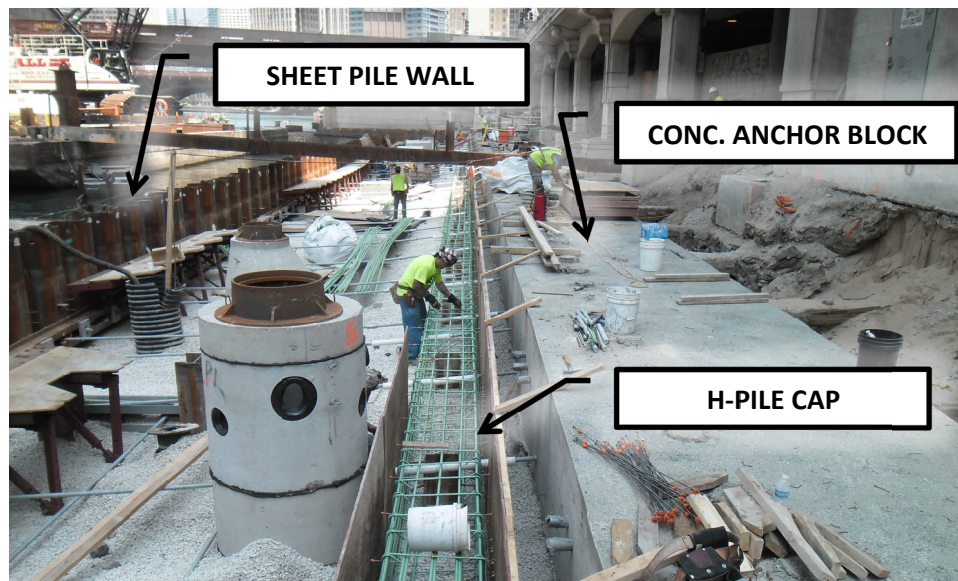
Construction of Slab Support Beam with H-Piles in the Cove
